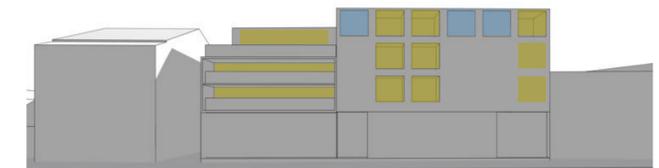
Solar access to adjacent dwellings - 133-149 Botany Road
